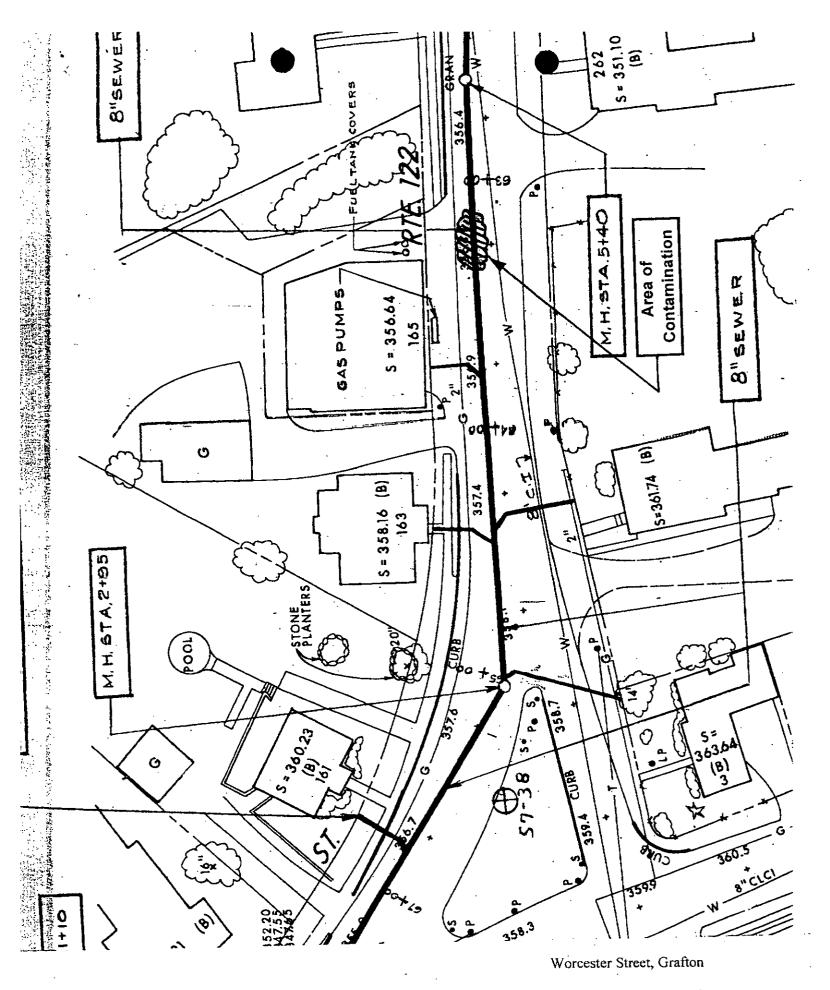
URAM Completion Statement RTN 2-12437 Location Plan
